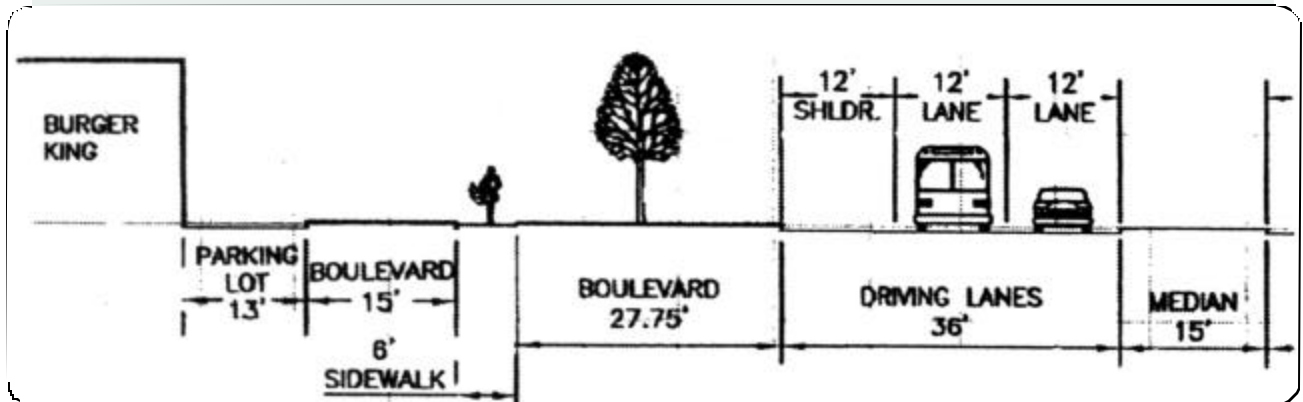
Existing street section of Hiawatha Avenue between 46th Street and 45th Street, facing south.
